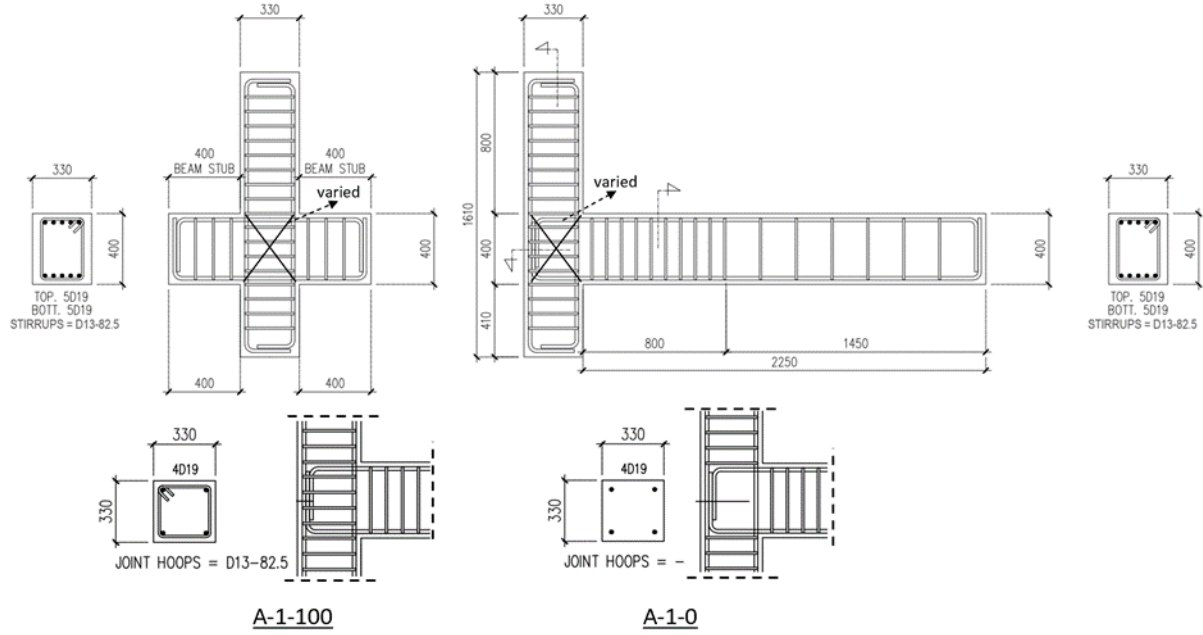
Reinforcement details of specimens A-1-100 and A-1-0 (Note: all dimensions are in millimeters).
